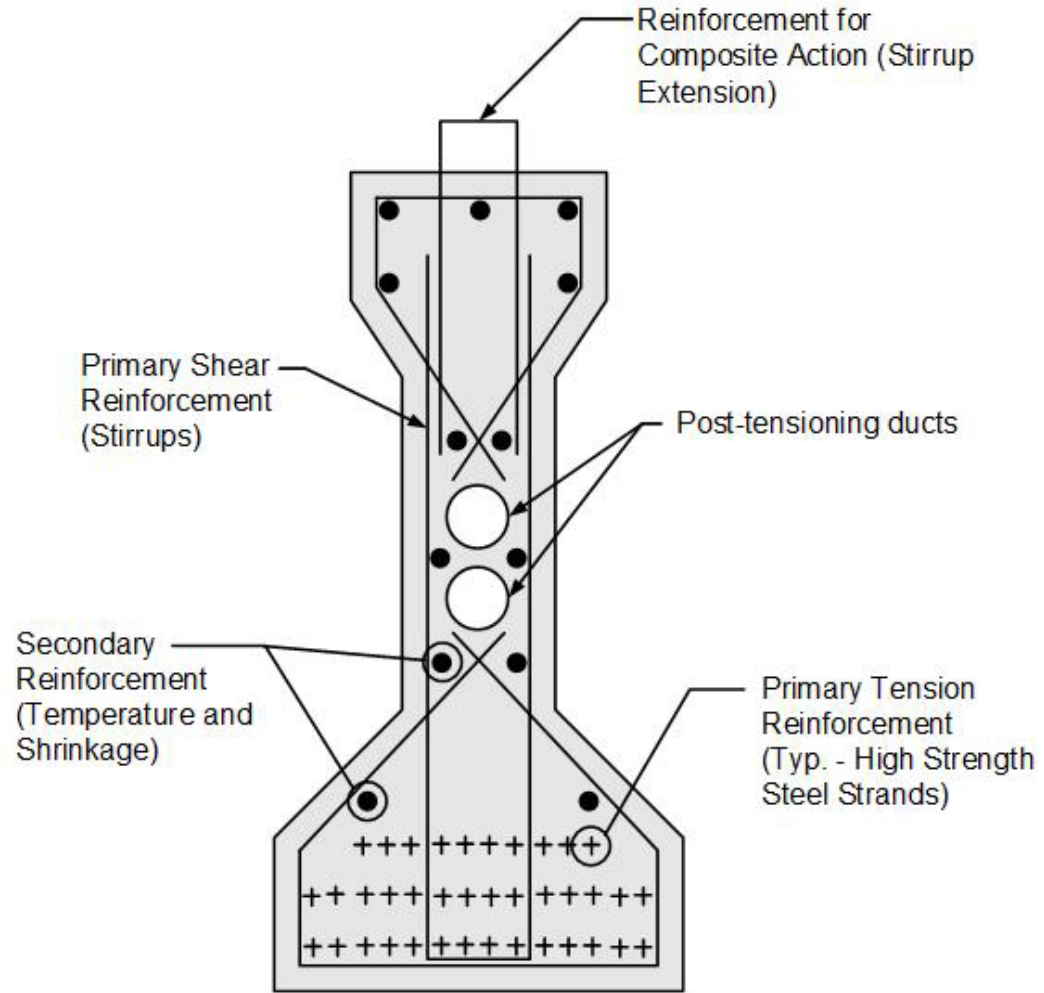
Steel Reinforcement in a Prestressed I-beam
